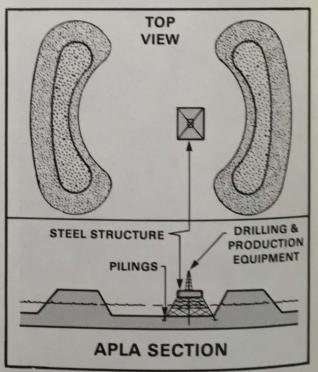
An alternate to placing drilling and production facilities on the berm is to install them on conventional steel jacket platforms, anchored to the sea floor, with piling. The berm protects the structure from moving ice.
